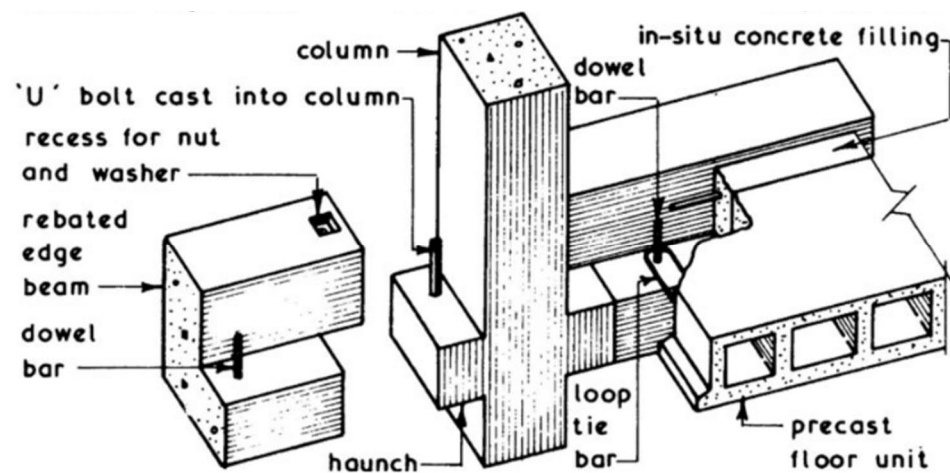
Typical details of precast beam-to-column connections (Chudley & Greeno, 2014, p. 620)
